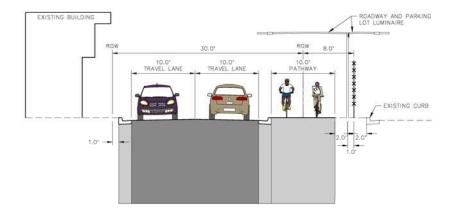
North Star Street (W. 30th Avenue to W. 32nd Avenue) - Alt. B
